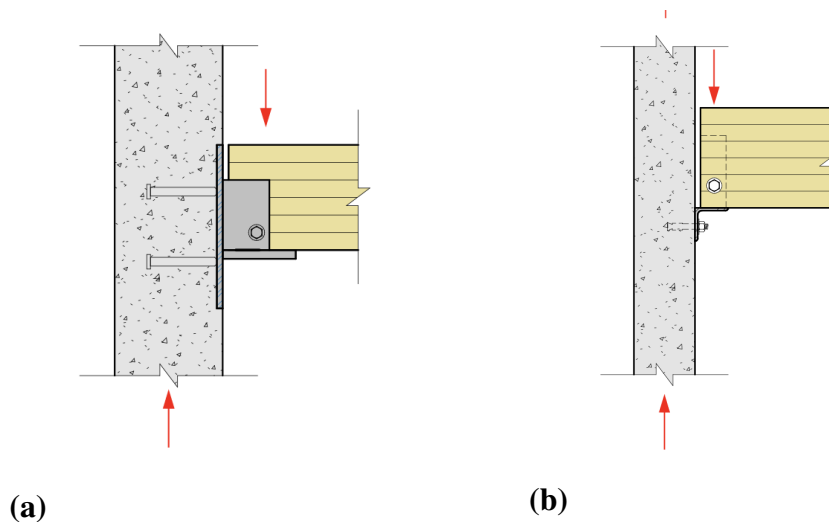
Drawing of two connections where the beam is perpendicular to wall connected to face of wall, a) beam hanger b) knife plate. Taken from WoodWorks (2021)
